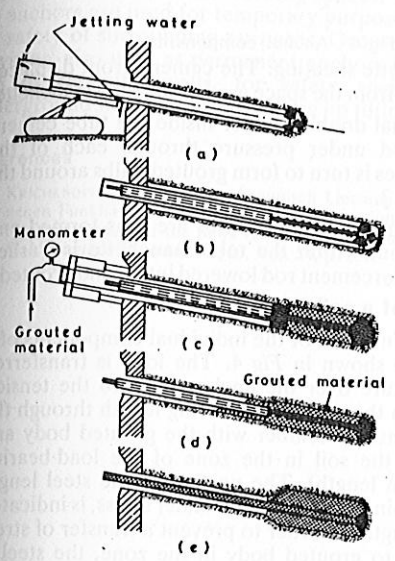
Construction of grouted anchors without packer showing (a) insertion of casing pipe (b) introduction of tension member (c) pulling and grouting of tube (d) completed anchor (e) final shape of pipe anchor
